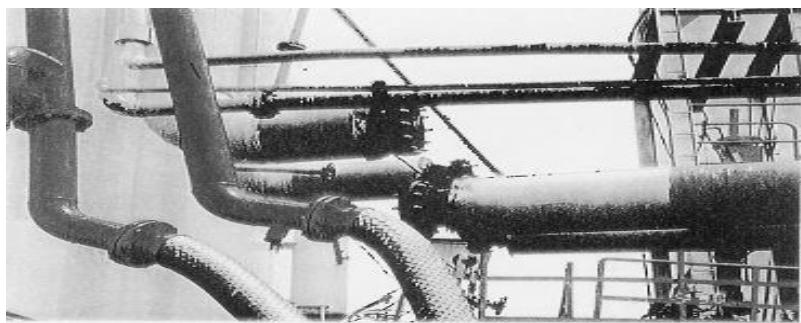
A rigid piping connection has failed, where as a flexible pipe with hose survived the Hanshin-Awaji Earthquake i.e. Kobe earthquake 6.9 M, 1995
